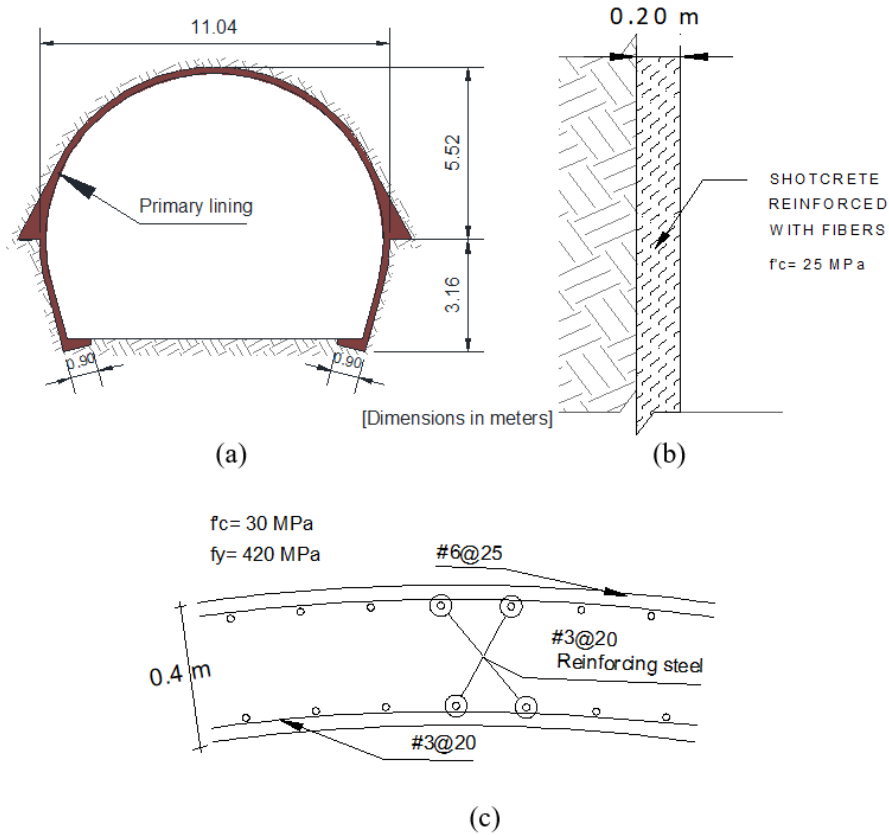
(a) Tunnel cross section, (b) primary lining, and (c) secondary lining
